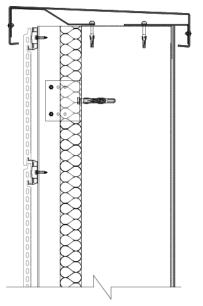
Tempio[®] FK kit. Vertical section. Roof edge.
